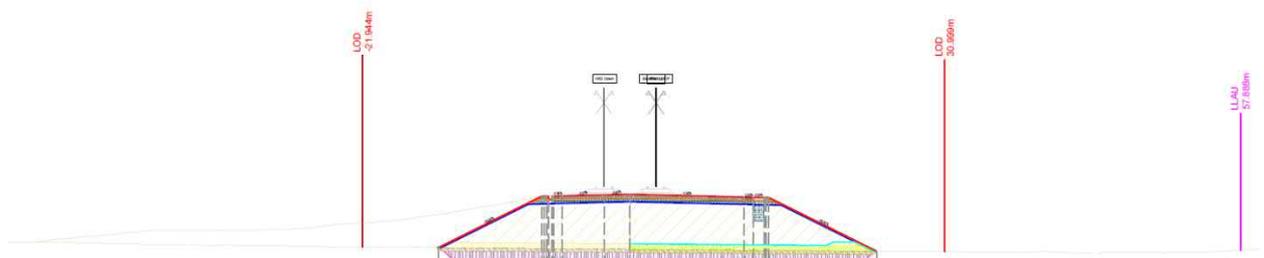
Cross Section of Twyford Embankment at Ch.HS2 82+240
